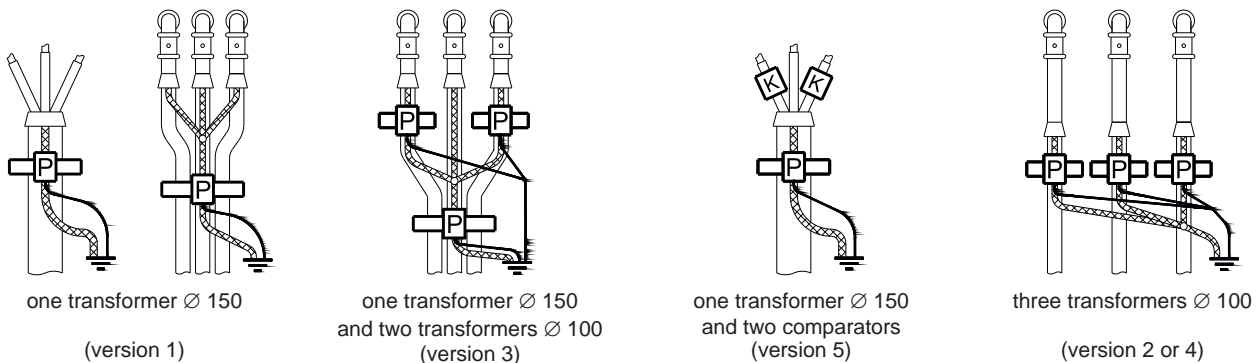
Assembly of current transformers and comparators onto MV cables depending on version.
